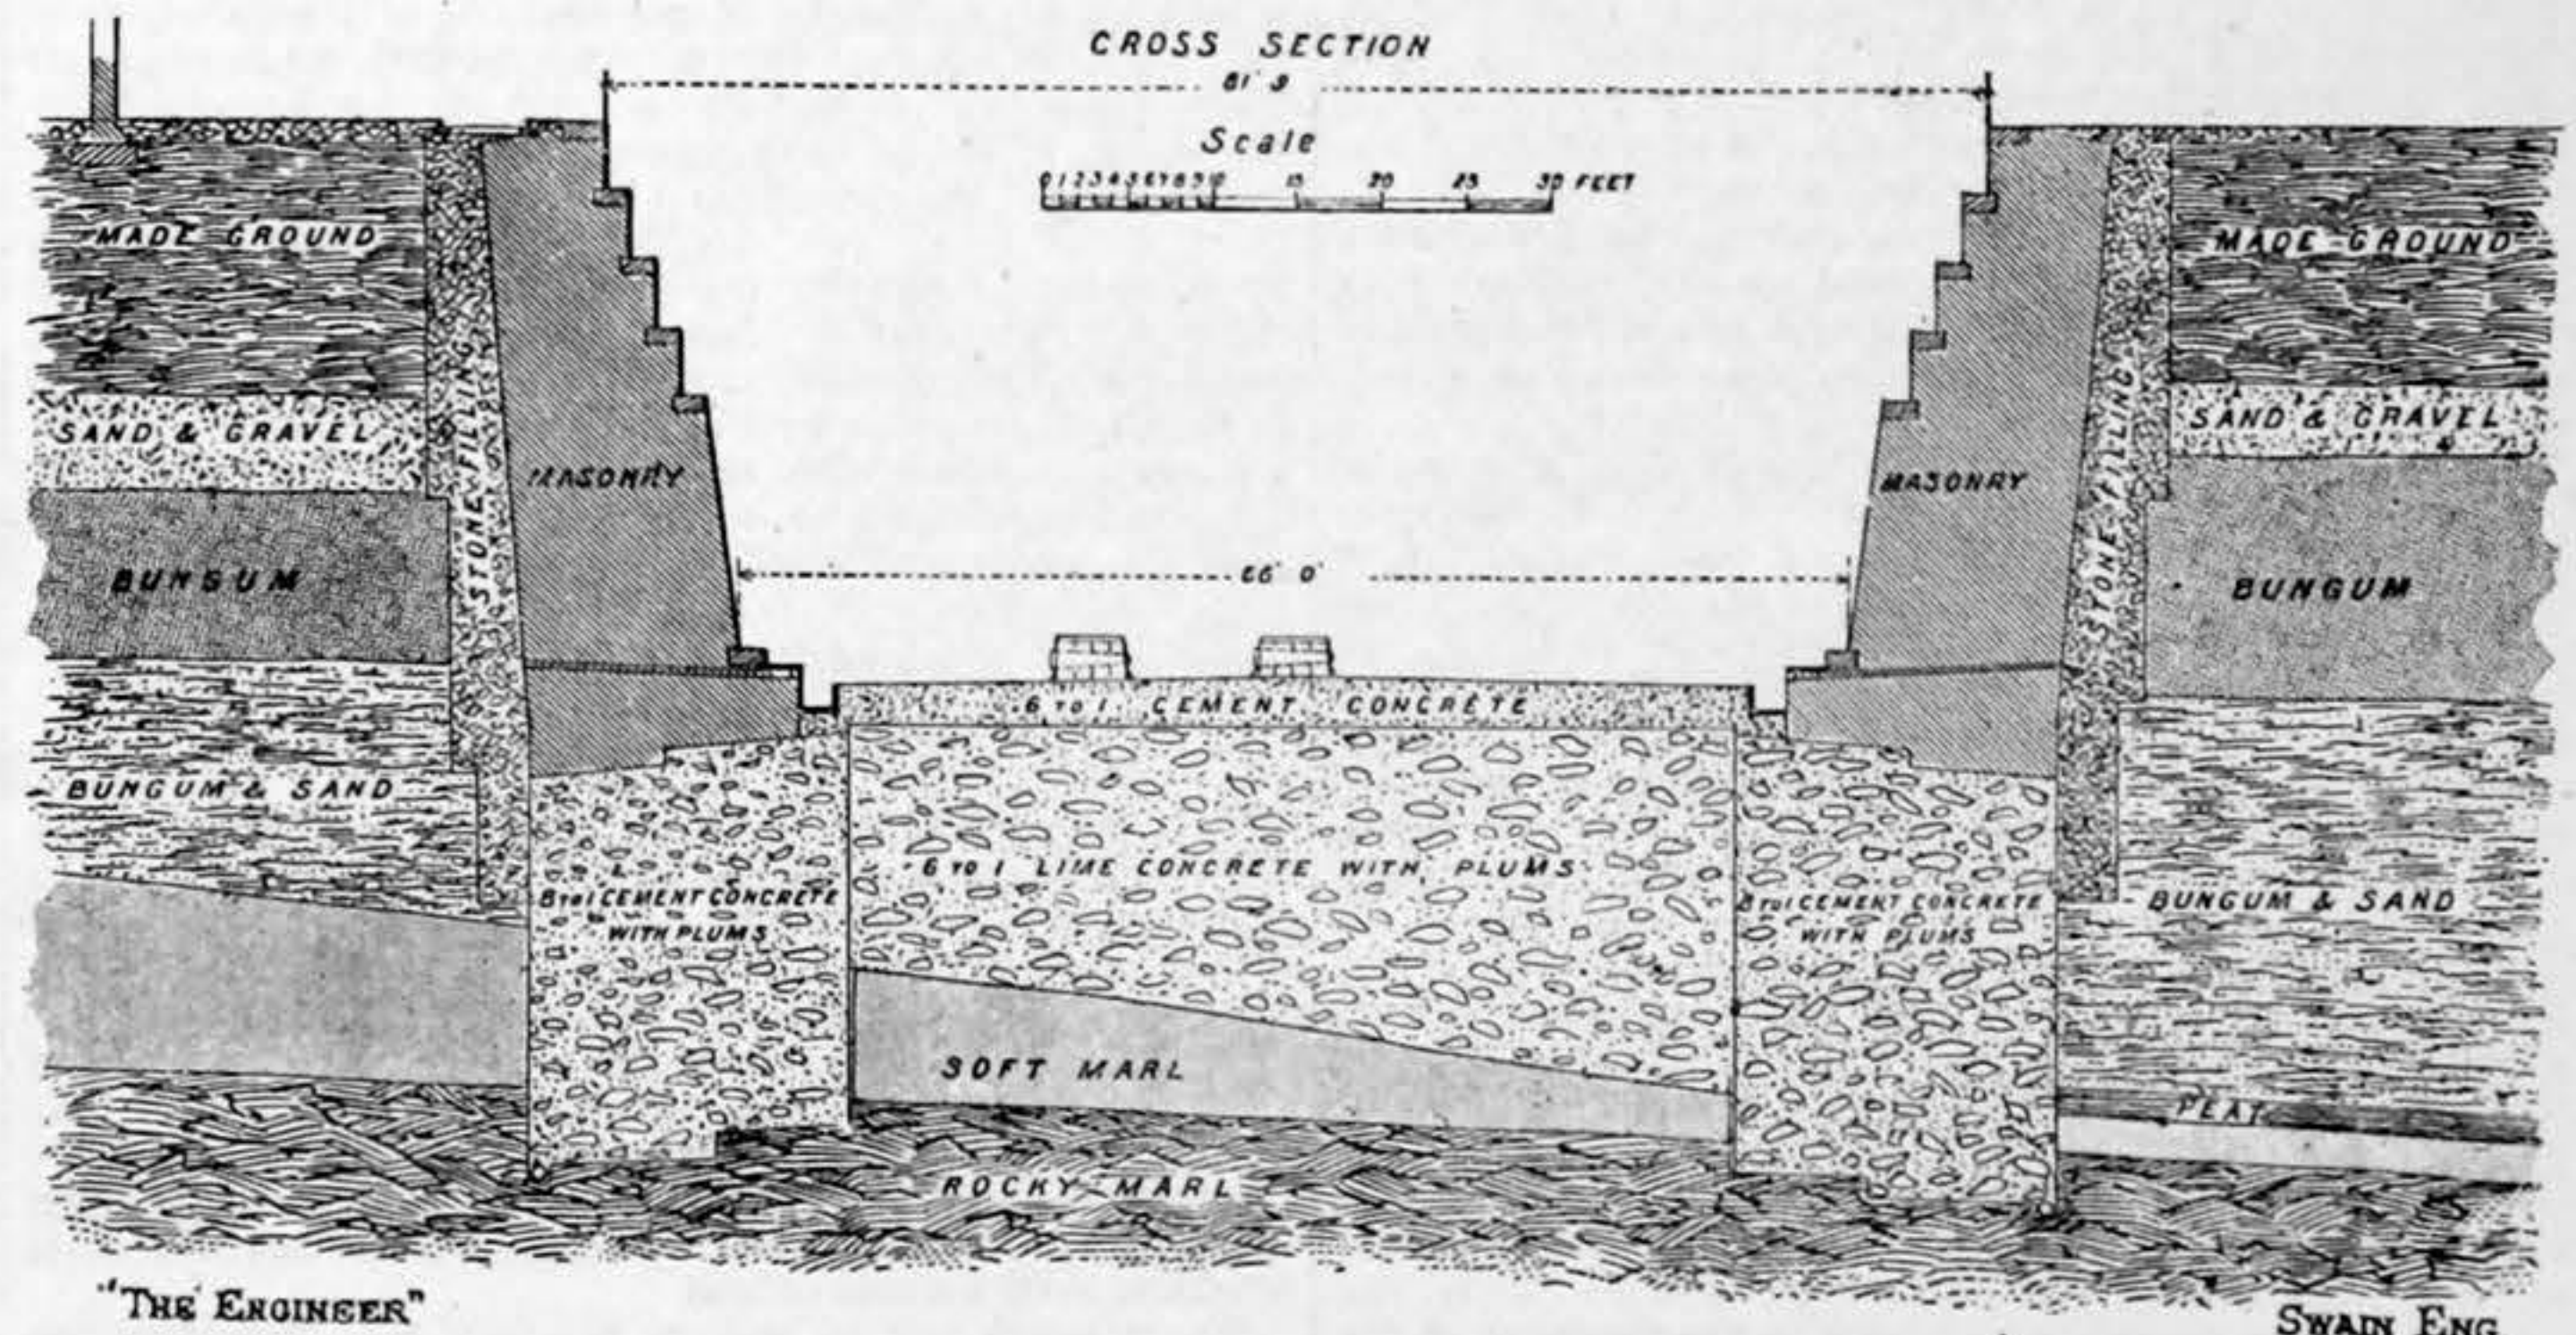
CONSTRUCTION OF NEW SINGLE DOCK
